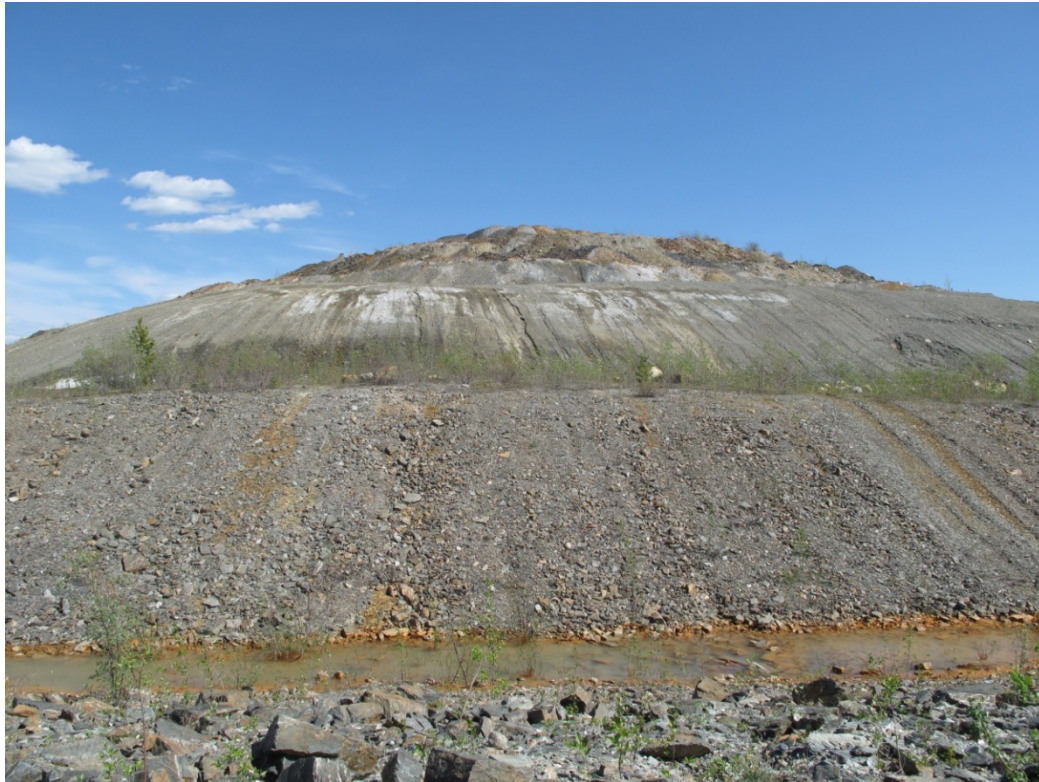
Wet spots and shallow subsidence on resloped surface of till starter dyke at Vangorda Waste Rock Dump
